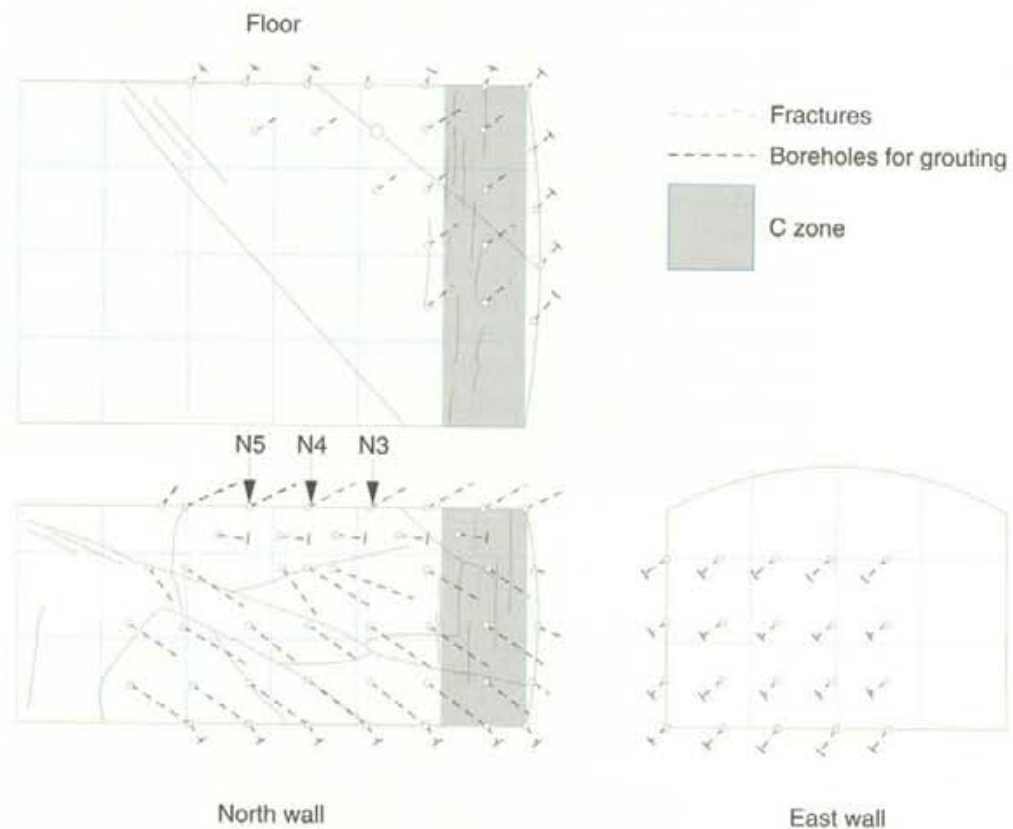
The grout hole pattern used in the first stage grouting of fracture zone C.
